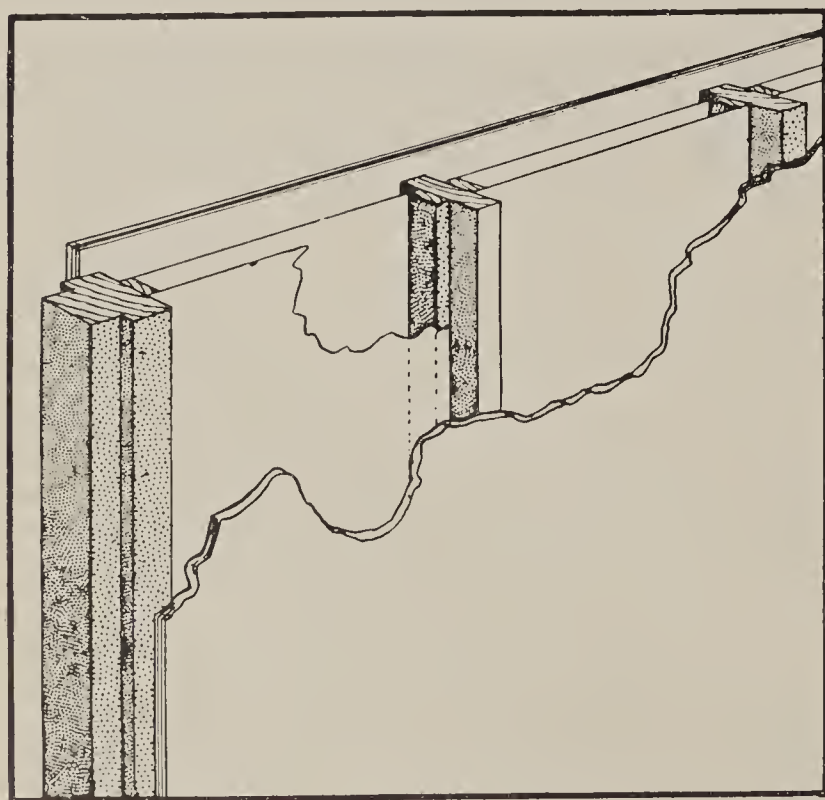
Wall panel with stressed covering, showing framework, covers, and two curtains of foil insulation.
